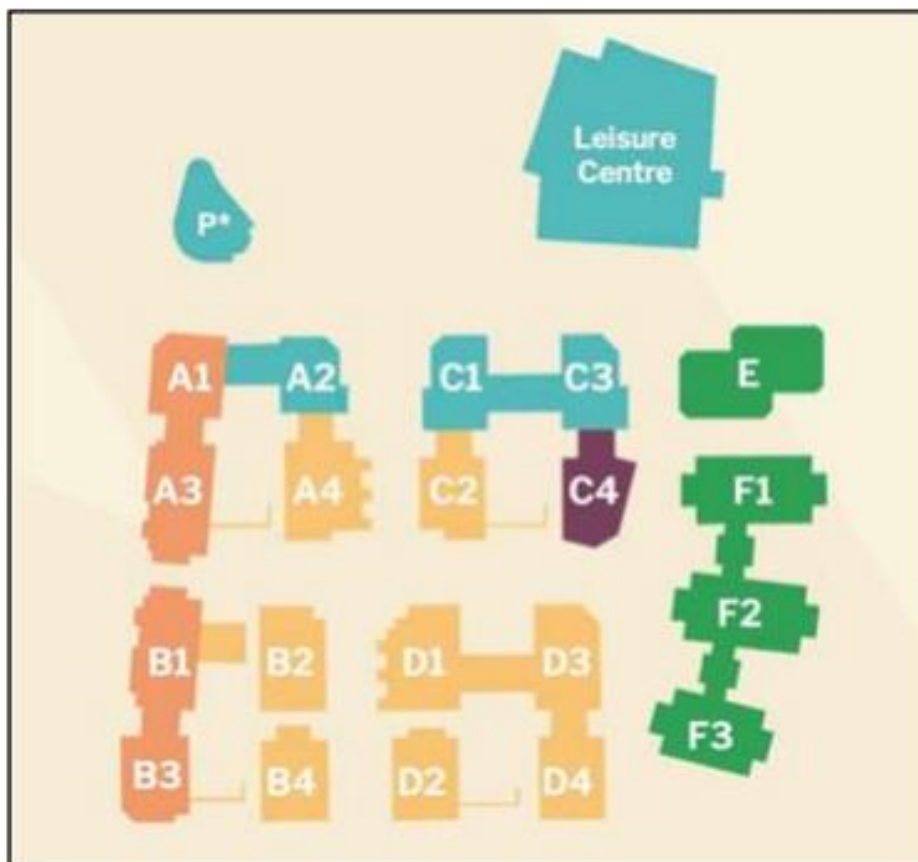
The proposed development layout (P = pavilion not subject of this application)
